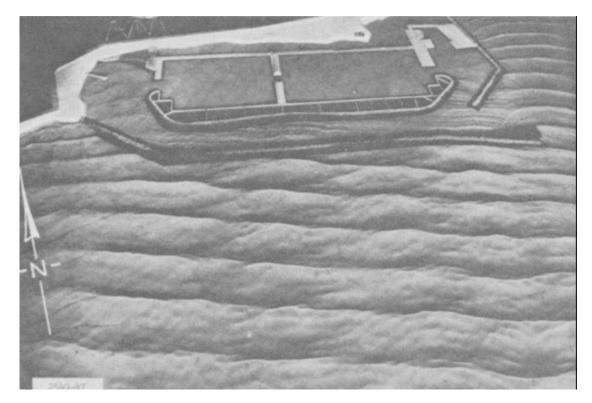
Wave patterns for the recommended improvement plan, Dana Point model.
